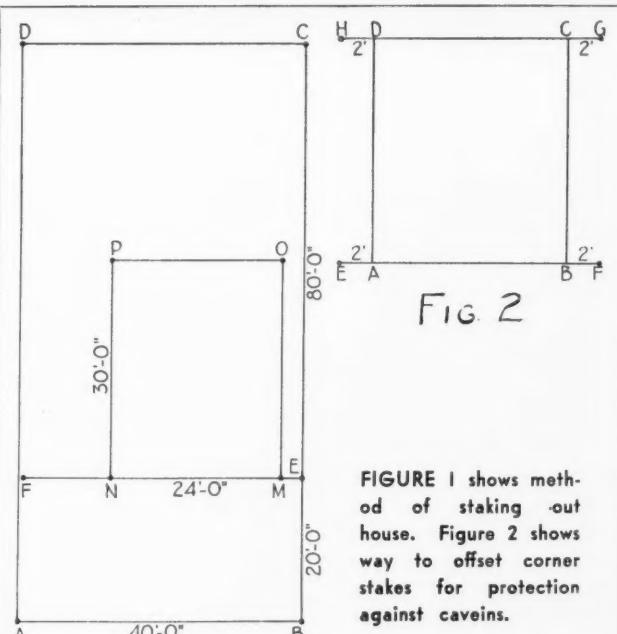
shows method of staking out house. Figure 2 shows way to offset corner stakes for protection against caveins.
